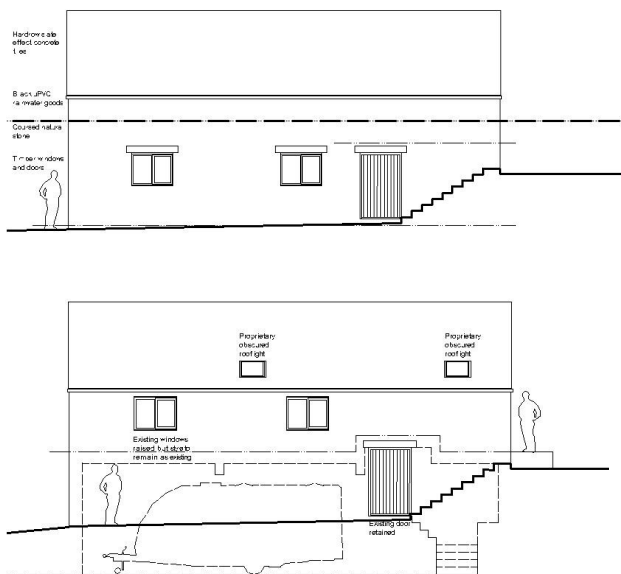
West elevation as existing (Top) and (Bottom) as proposed.
